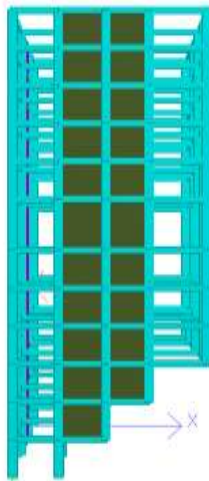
Side view of Hostel no. 05 with Shear Walls at center
